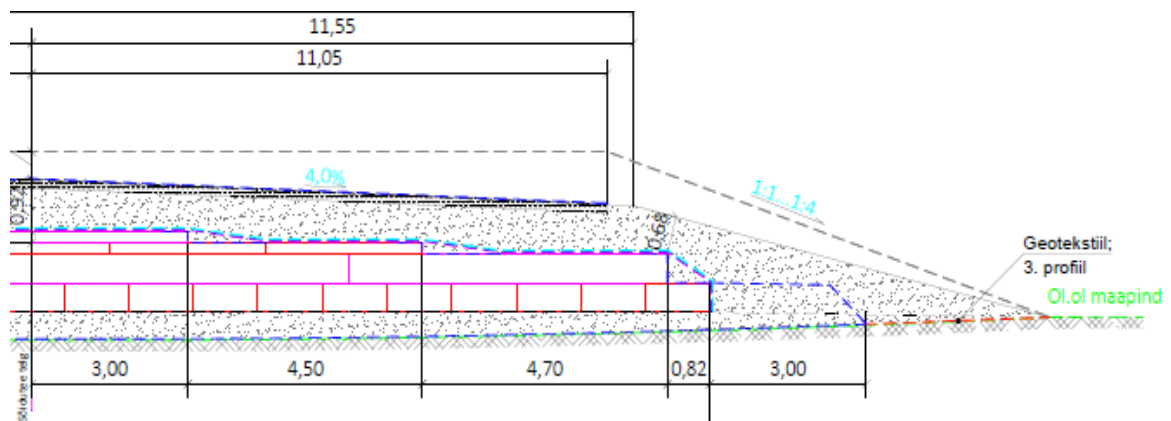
Cross-section of test section 4. Light weight aggregate reinforcement.
